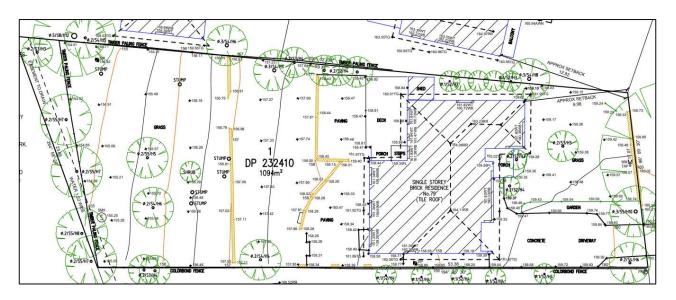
Survey extract showing drainage easement (Source: Nastasi & Associates)
